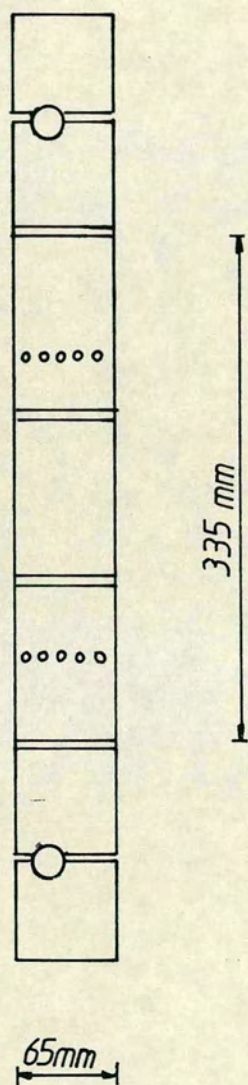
Eccentrically Loaded Single Course Prism
